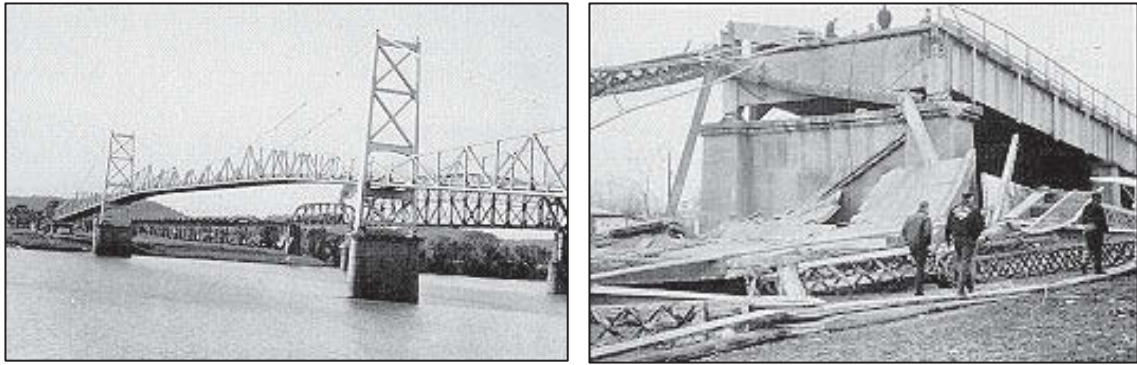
Silver Bridge before (left) and after the collapse (right) (FHWA, 1996)
